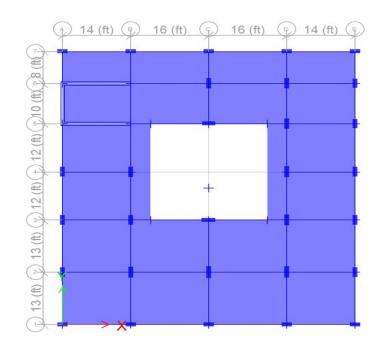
Plan view of (G+12) storied commercial building for Plan 02
